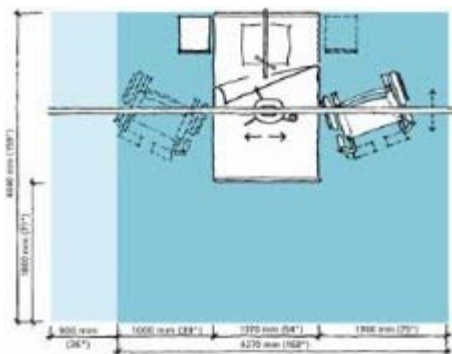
"Plan view of typical ceiling mounted patient lift" Courtesy of Arjo, Inc.
